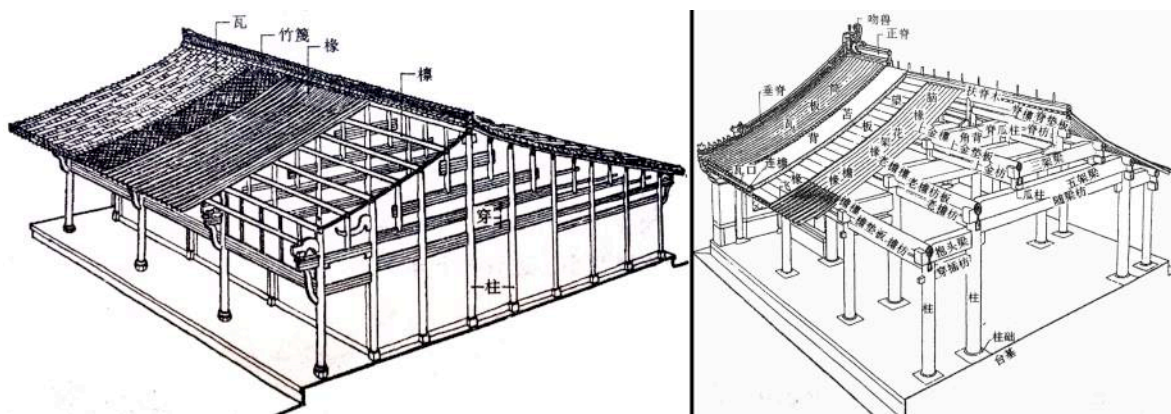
Structure: Beam-Lifted Style (left) and Crossing Bracket Style
